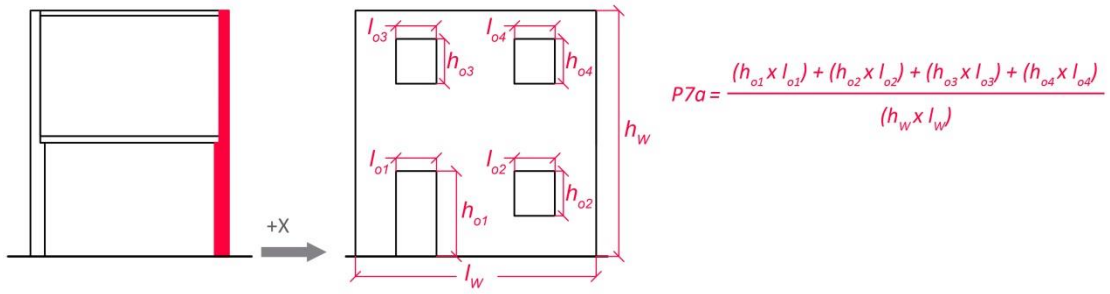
5: When evaluating buildings with more than one floor, the ratio P7a of wall openings can be obtained by taking into account the whole height of the wall (section and elevation view)
